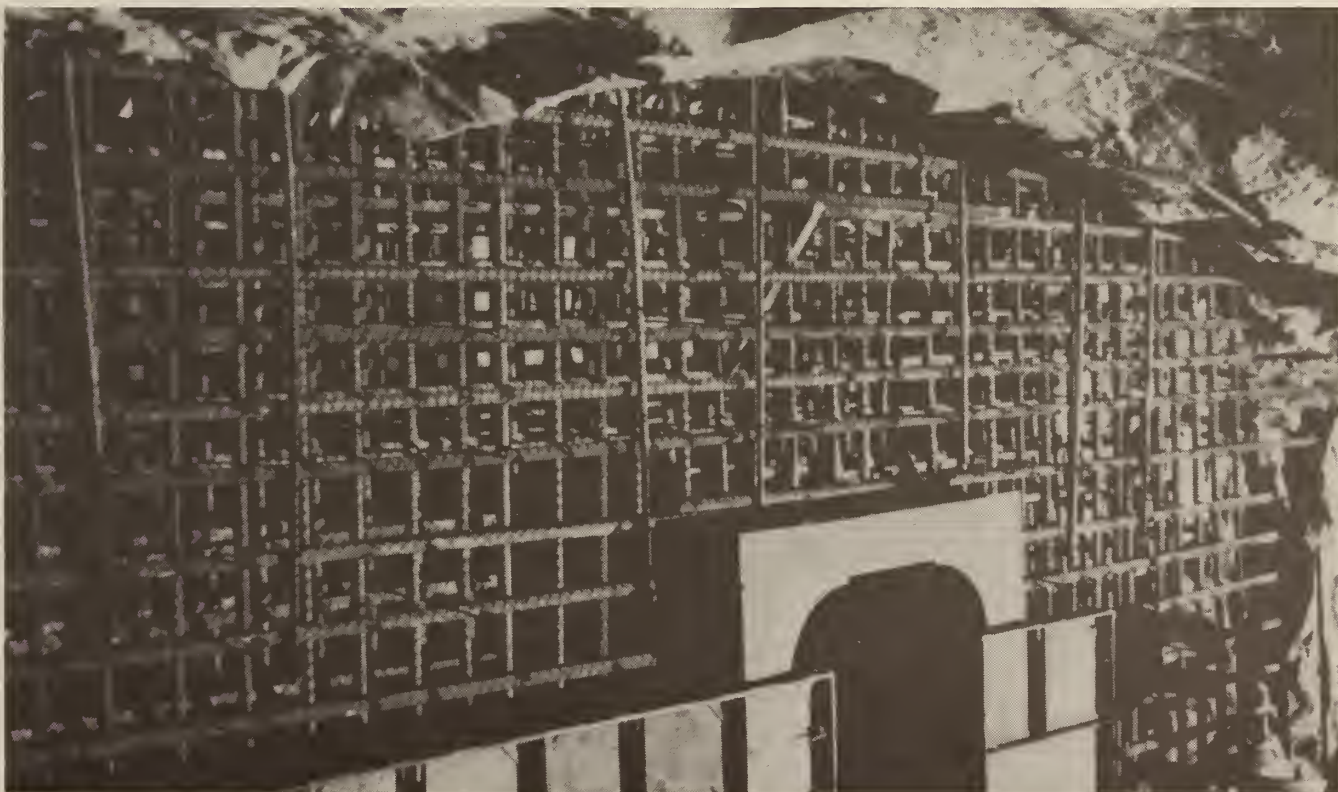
Reinforcement rods prior to pouring of concrete to construct bulkhead for an underground instrument room.
